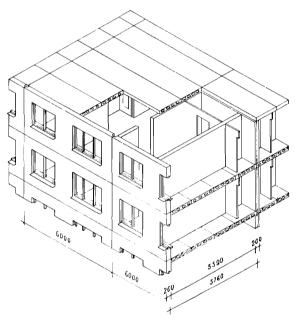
Frameless building with bearing cross walls, spaced at 6 m, floors of panels resting along 2 sides.
